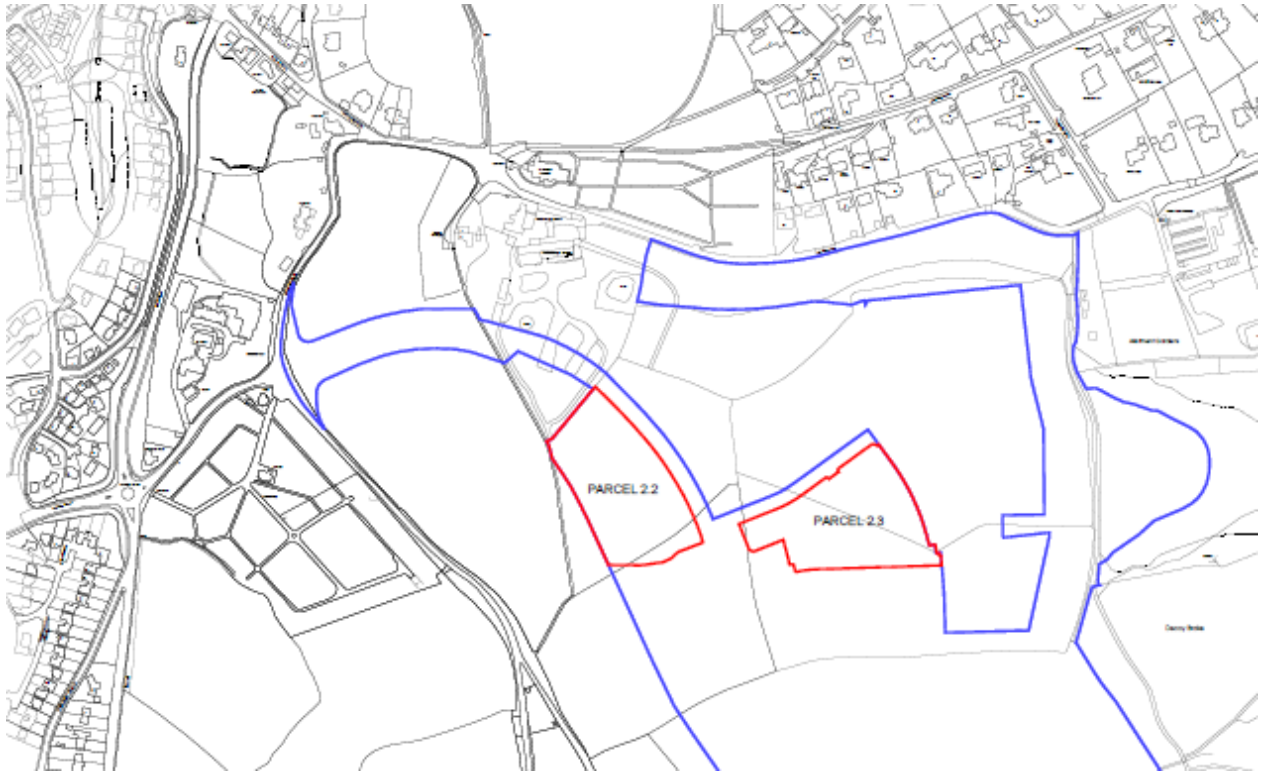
Phases 2.2 and 2.3 - Site Location Plan
